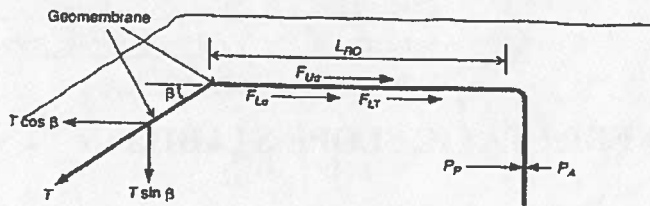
F Cross section of geomembrane runout section with anchor trench and related stresses and forces involved.
